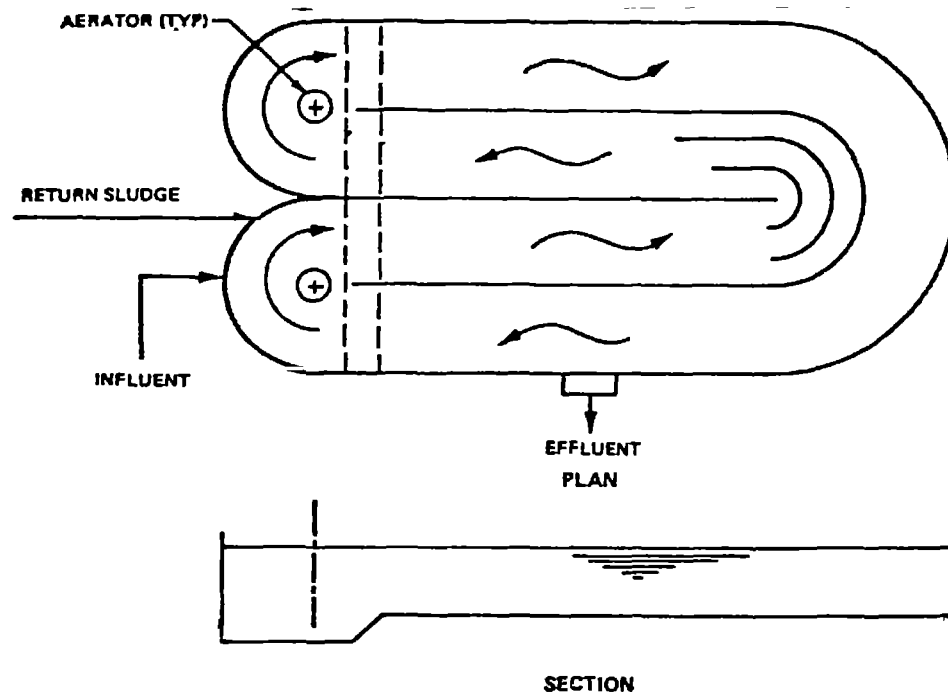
Typical Carrousel oxidation ditch (Jacobs 1975).
